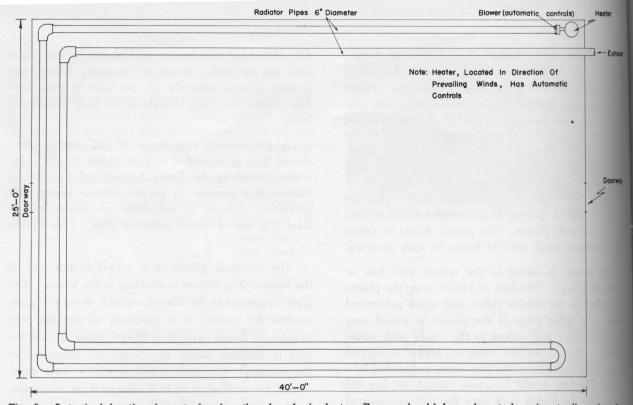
A typical heating layout showing the closed air ducts. Fumes should be exhausted and not allowed to become a part of the air in the greenhouse.
